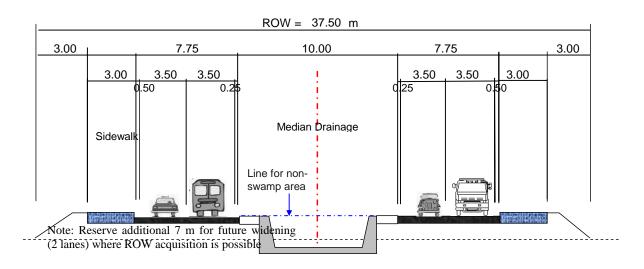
Typical Cross Section for Swamp Area (Types 1 and 2)
